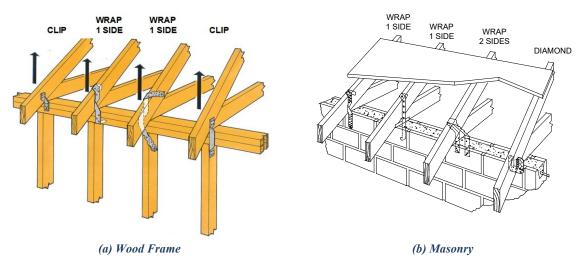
Typical Hurricane Roof-to-Wall Metal Connectors
